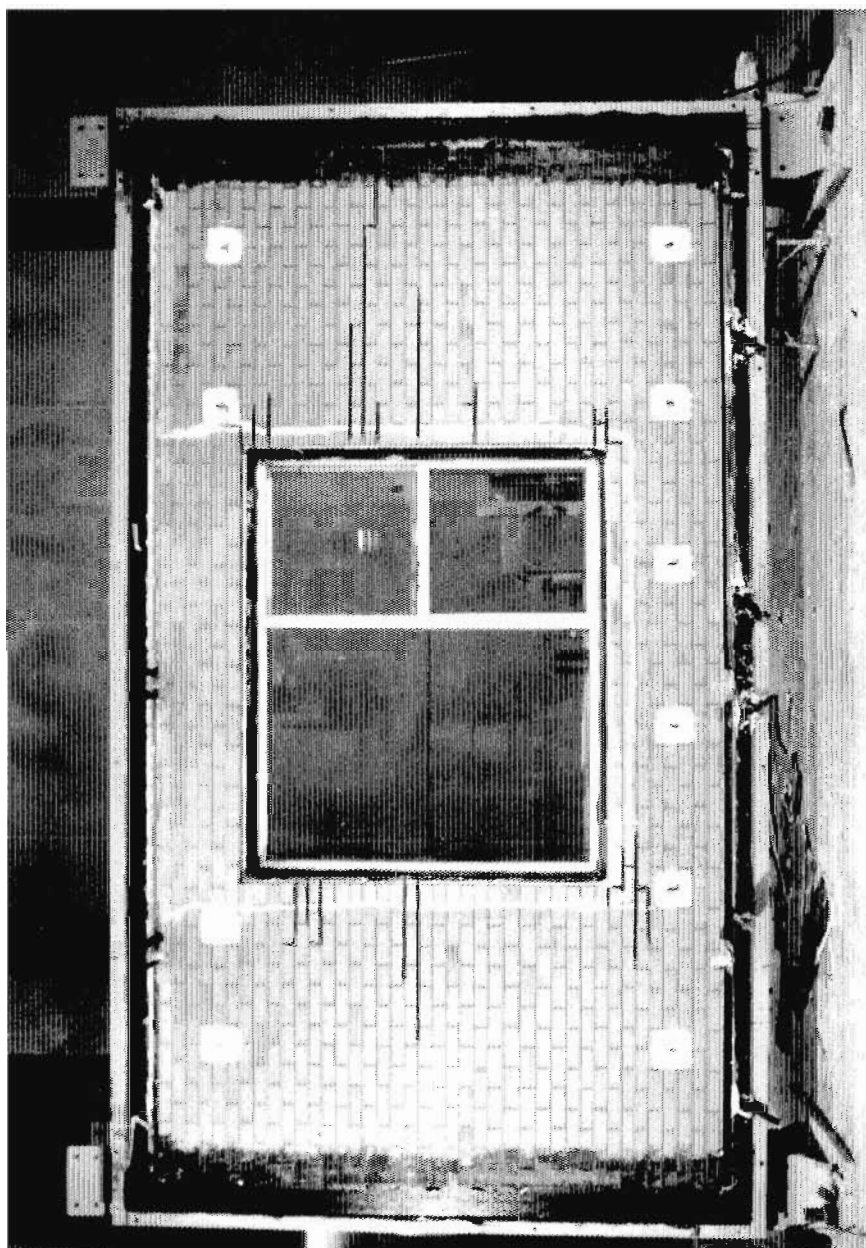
CRACK PATTERN AT FAILURE - WALL4
